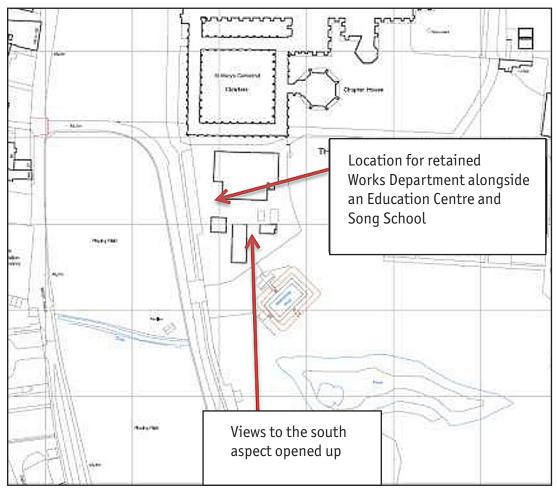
Location of retained works department (and heritage/education centre and Song School)
